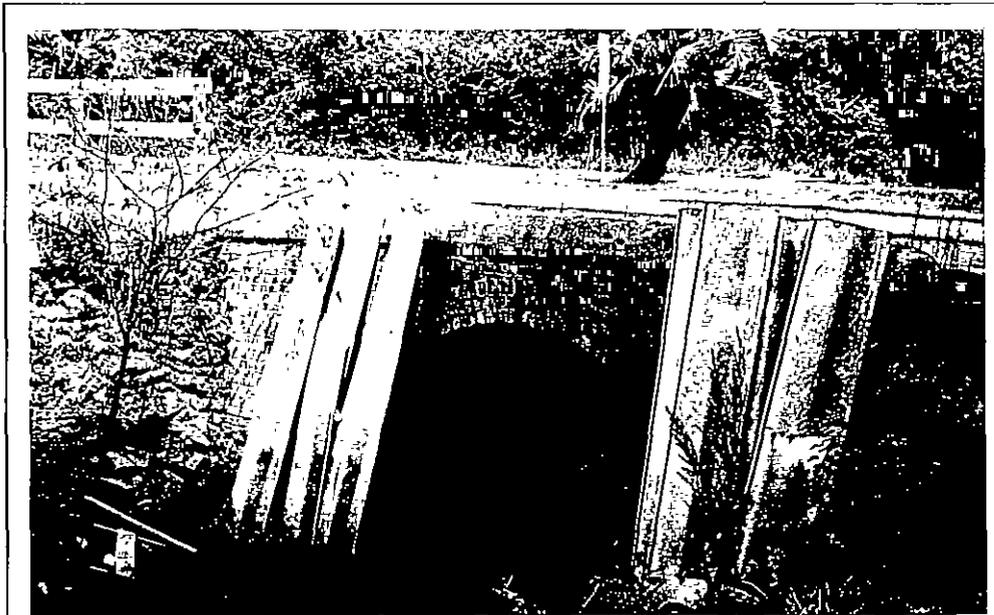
South wall of the brick arch culvert, looking north. Note the effort to shore the collapsing wall.
